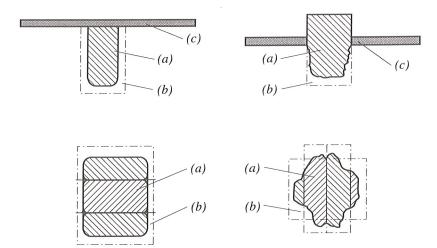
Beams and columns before and after the exposure to fire. (a) remaining cross-section, (b) charred timber, (c) fire barriers.
